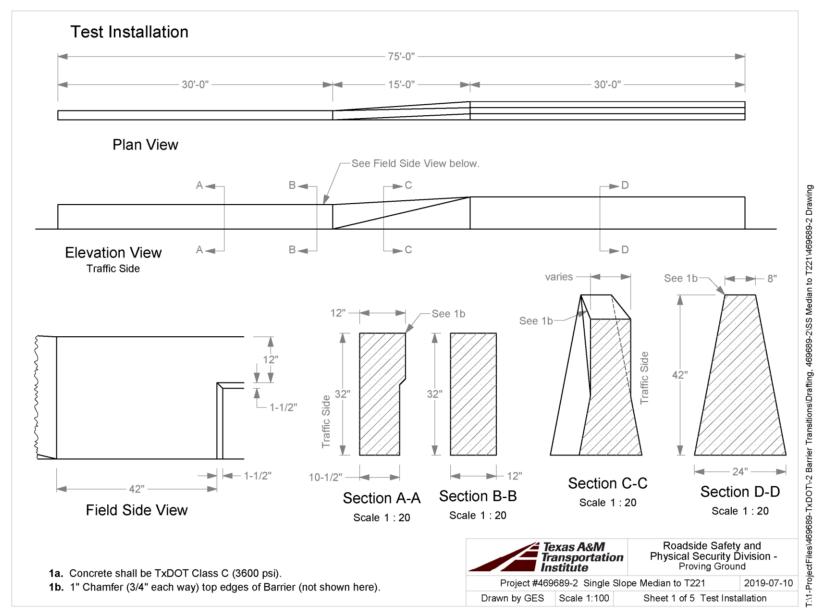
Overall Details of T221 Vertical Wall to SSCB Transition.
